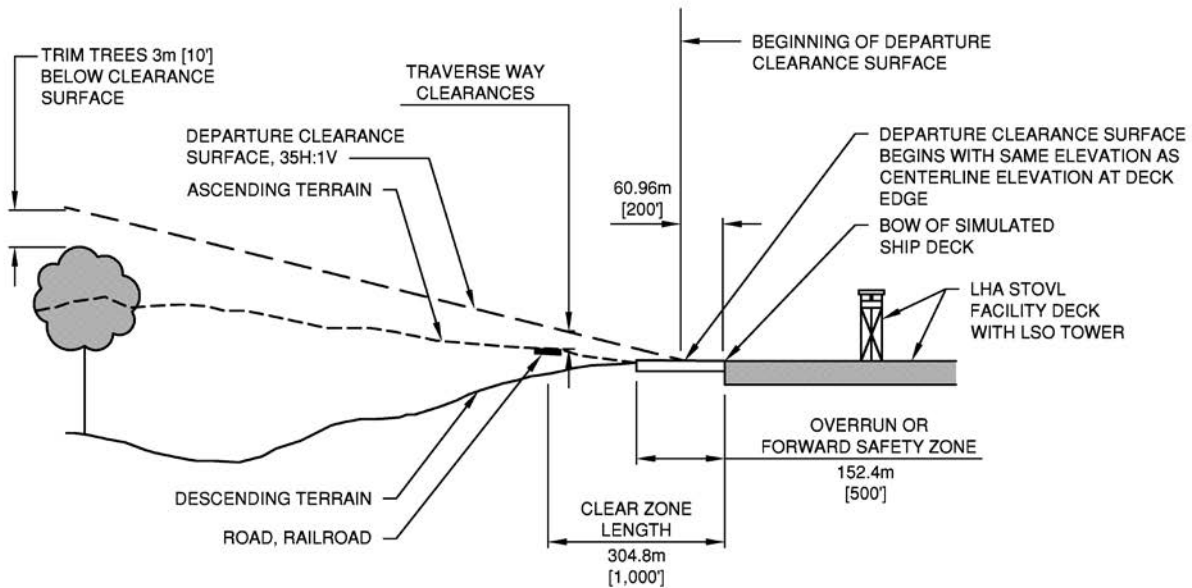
LHD STOVL Facility Departure Clear and Accident Potential Zones
